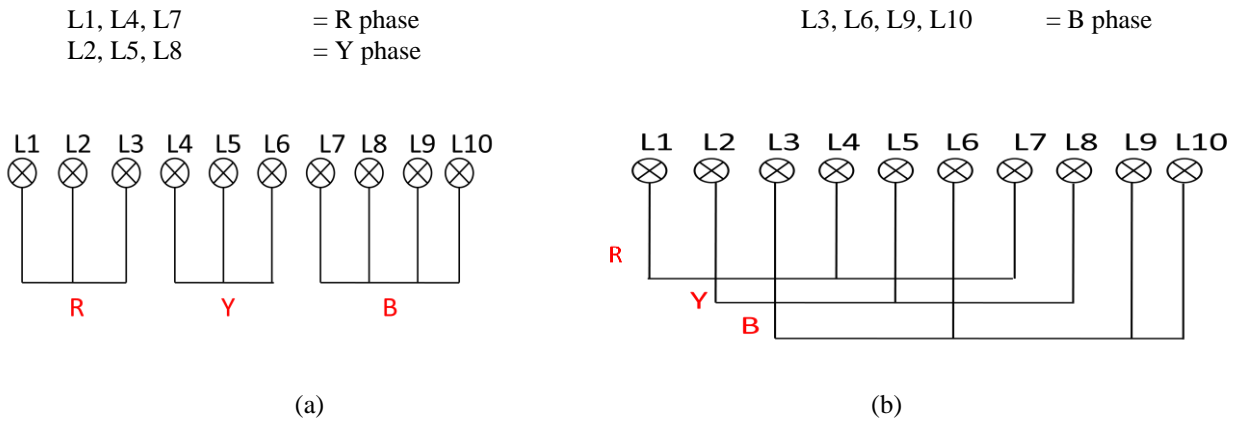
(a) Existing Arrangement (b) Modified Arrangement
